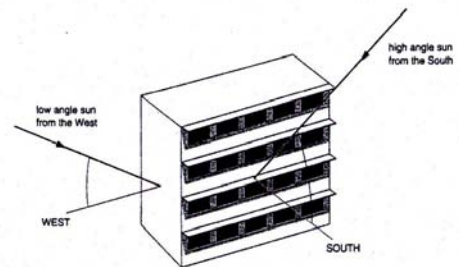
An orientation with the main facades of the building facing north and south is preferable
